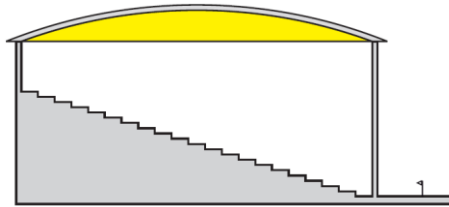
A post and beam style roofing structure (John, Sheard and Vickery 2007)
